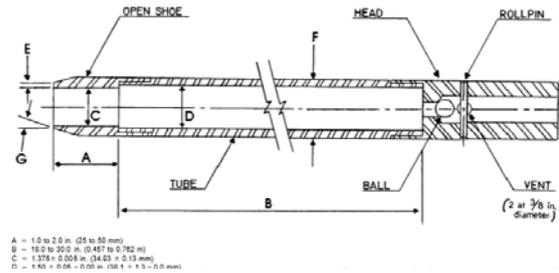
Split Barrel (STM, D 1586)
